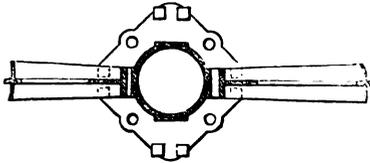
Plan of Connecting Piece, with Girders, &c.
